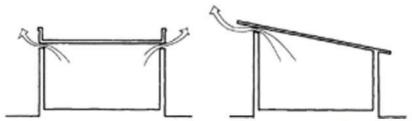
In the case of pitched roofs, the opening should be in the higher wall.
